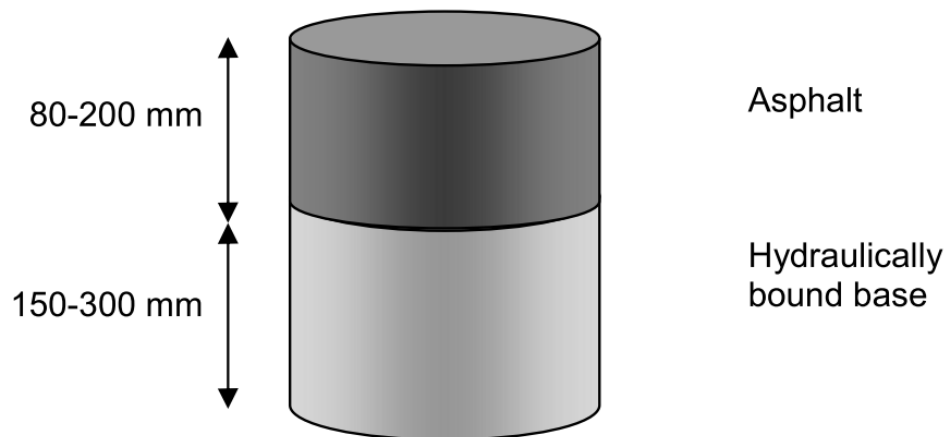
Typical cross section of European semi-rigid pavement for heavy traffic [204]
